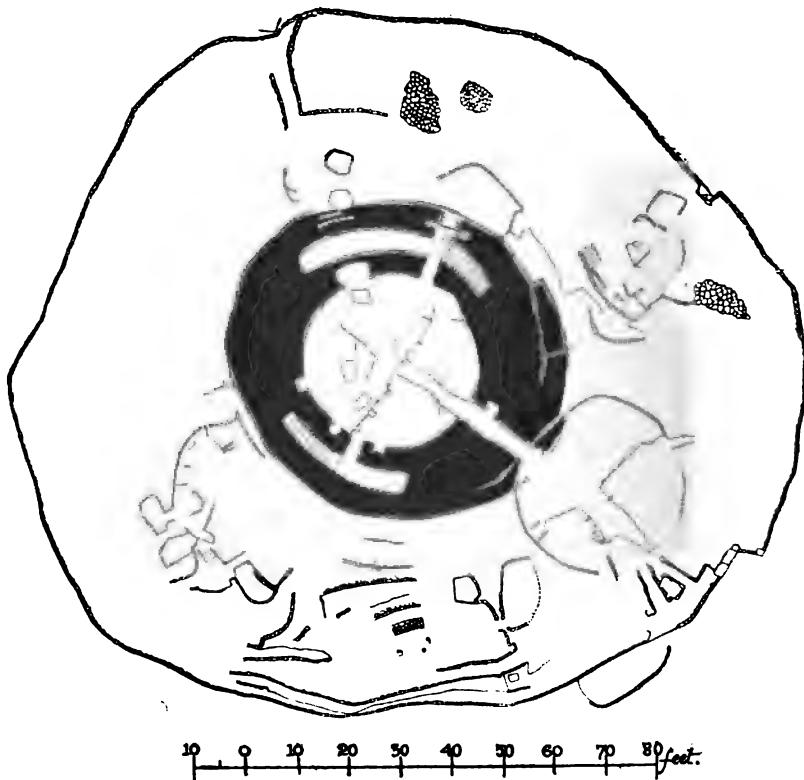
Ground Plan of the Road Broch and its outbuildings, with the encircling wall.
